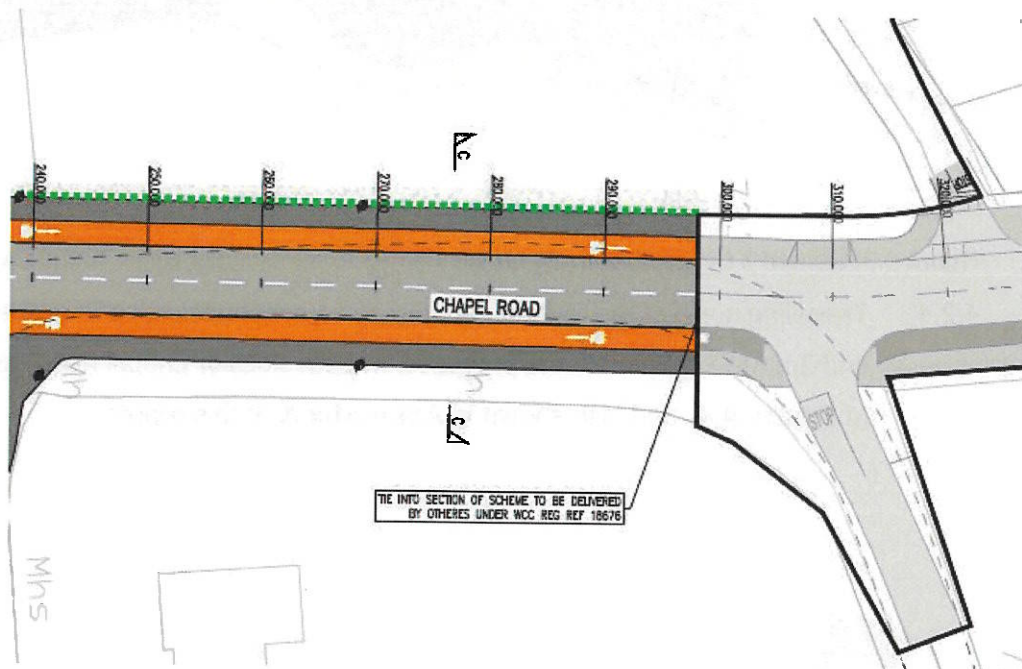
Section 1 Design Proposals to Tie in with New Chapel Road Alignment
